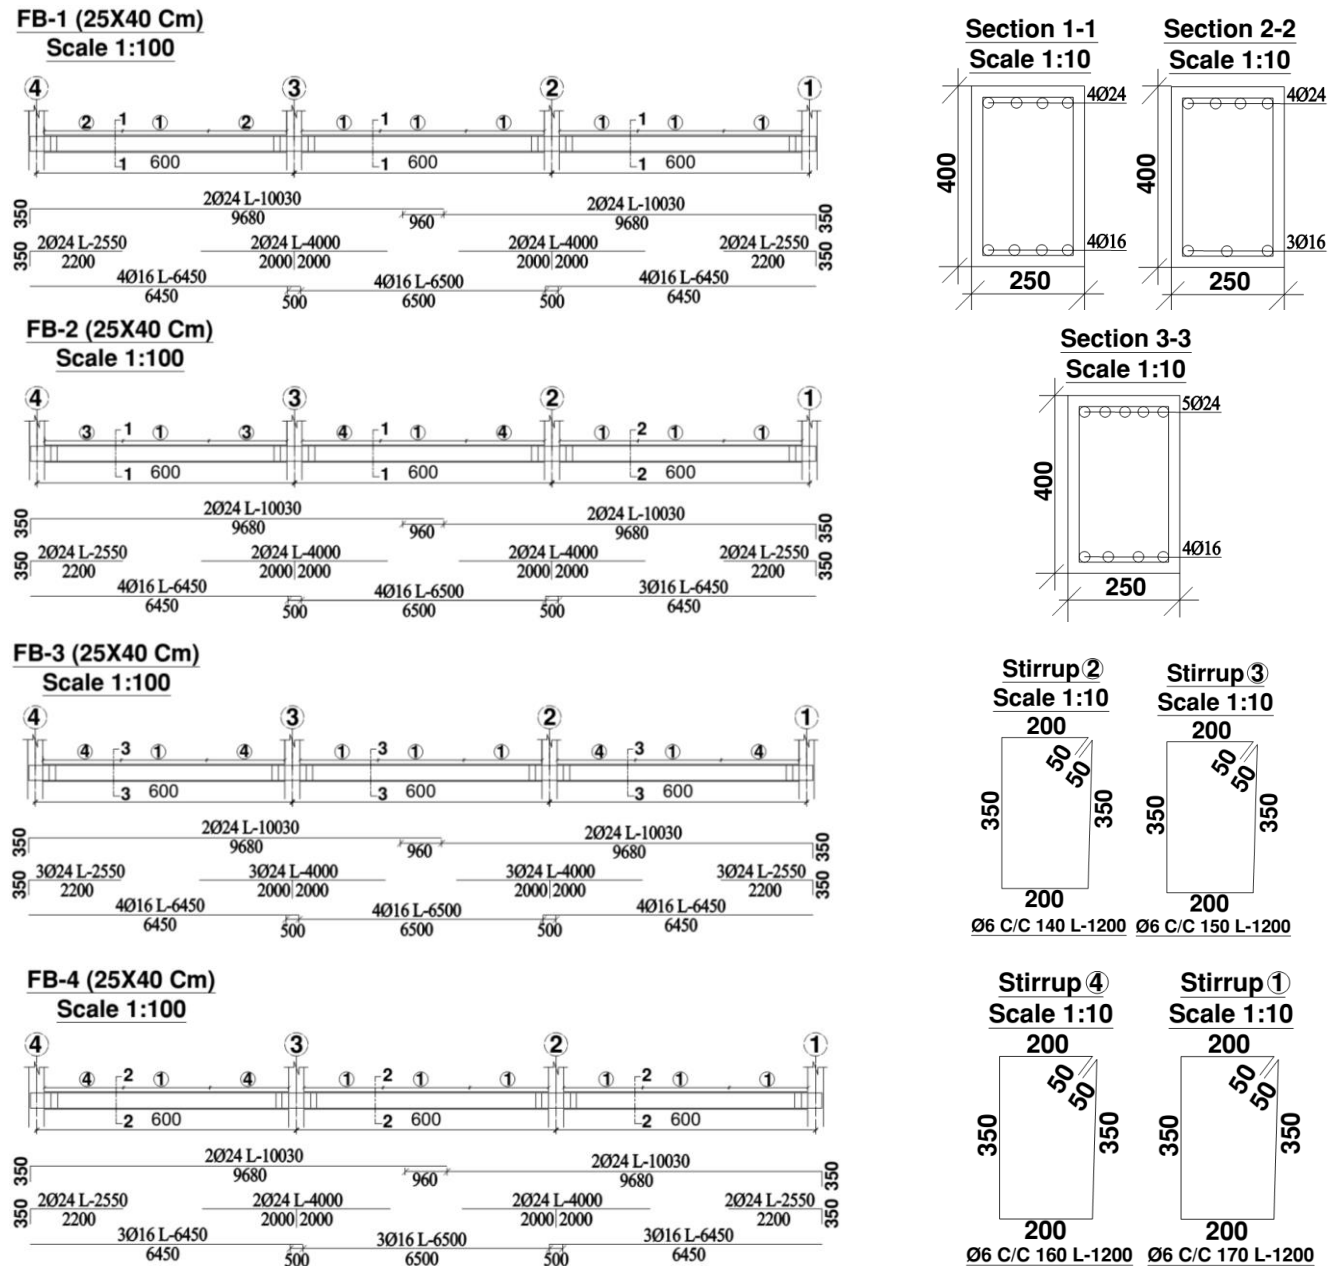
Sample beam detailing for G+7 building with C-40 concrete
